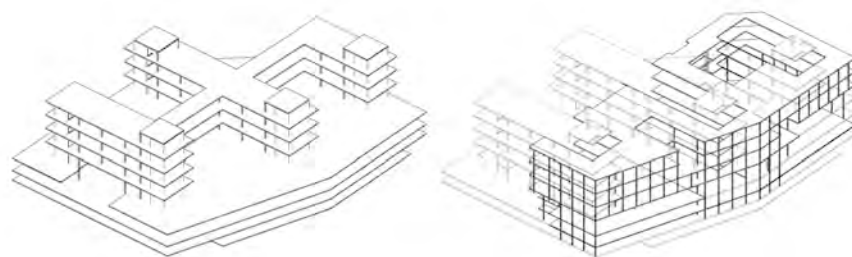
Structural principle including a hybrid construction system combining wood and concrete (Document: Bauart).
